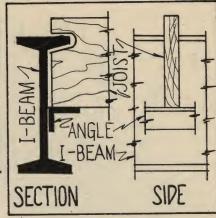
Wood Joist Resting on Steel Shelf Angle Riveted to Web of Steel Beam.
